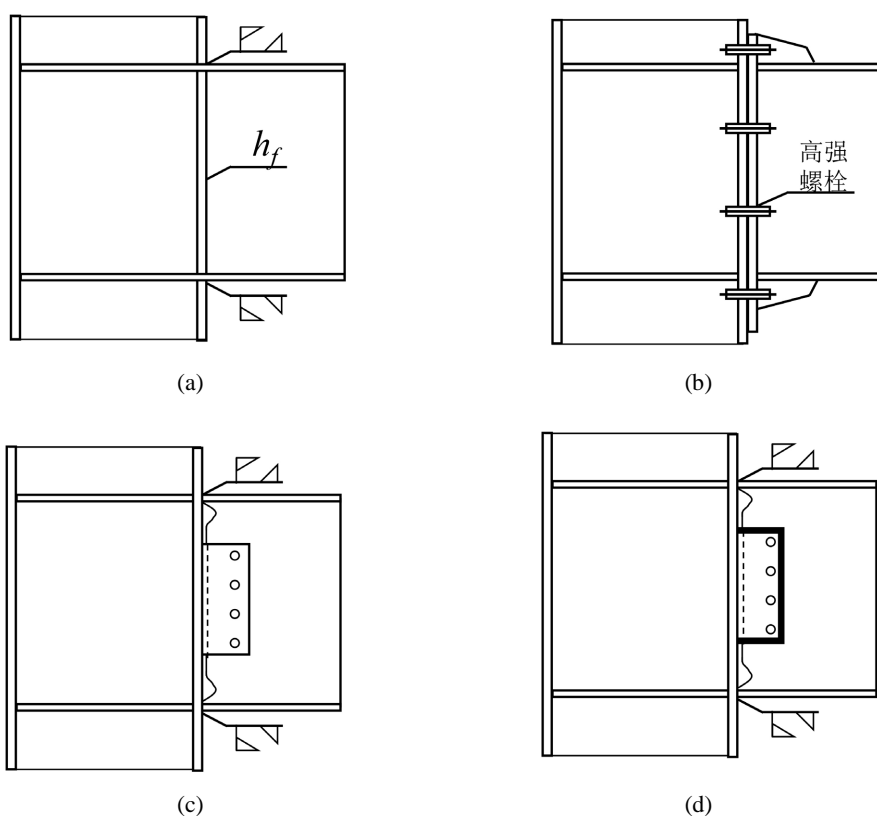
Common beam-column joint forms [15]: (a) All welded joints; (b) High strength bolted joints; (c) Weld joints on three sides; (d) Bolt welded mixed joints
